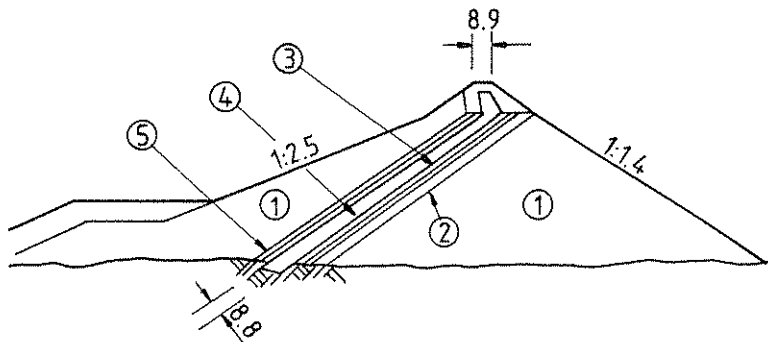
Nantahala rockfill dam with internal earth sealing (dimensions in m, adapted from Crowden 1960).
